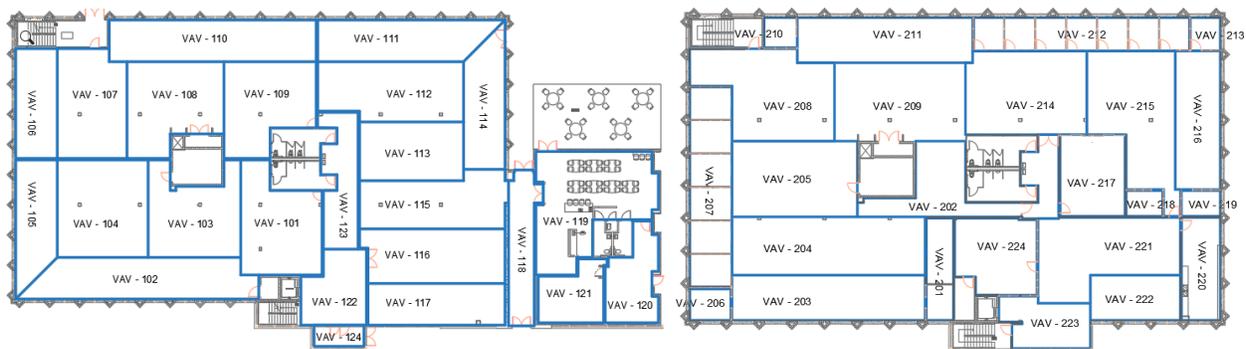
Zoning - Floor 1 (left) - Floor 2 (right)
